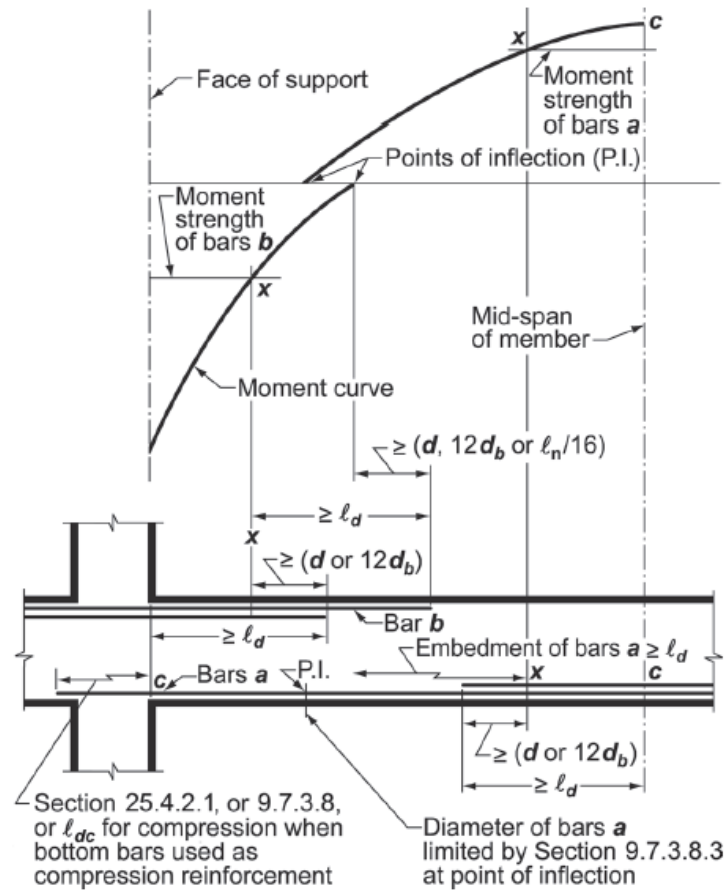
Development of flexural reinforcement in a typical continuous beam (ACI-318, Ch. 9).
